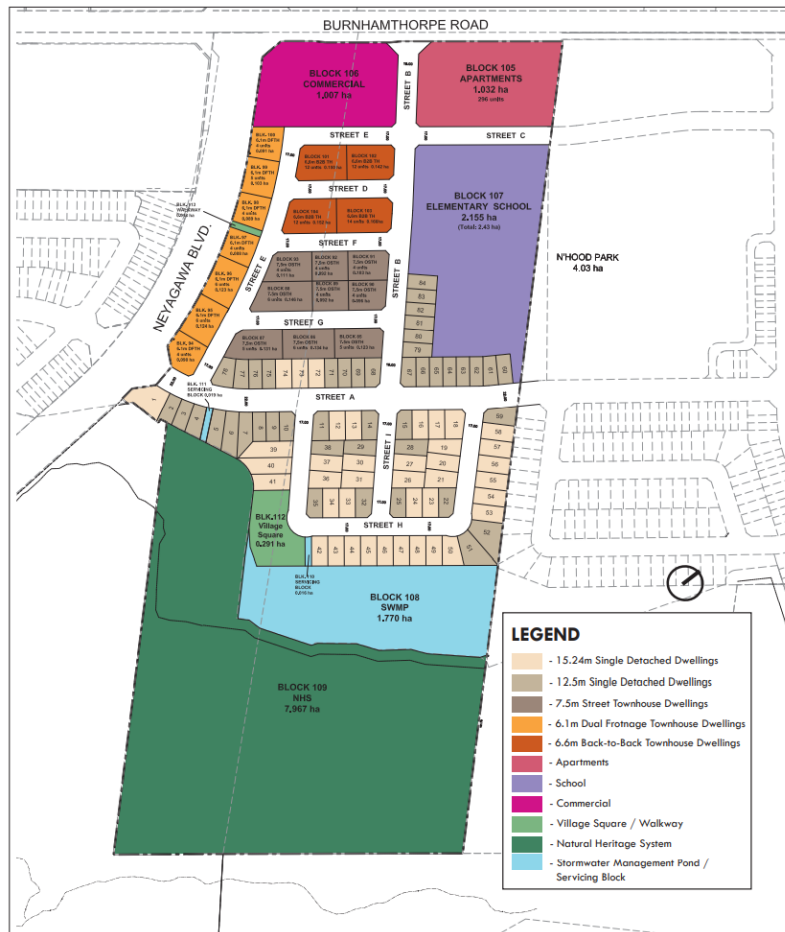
Development Master Plan from Urban Design Brief - NTS
